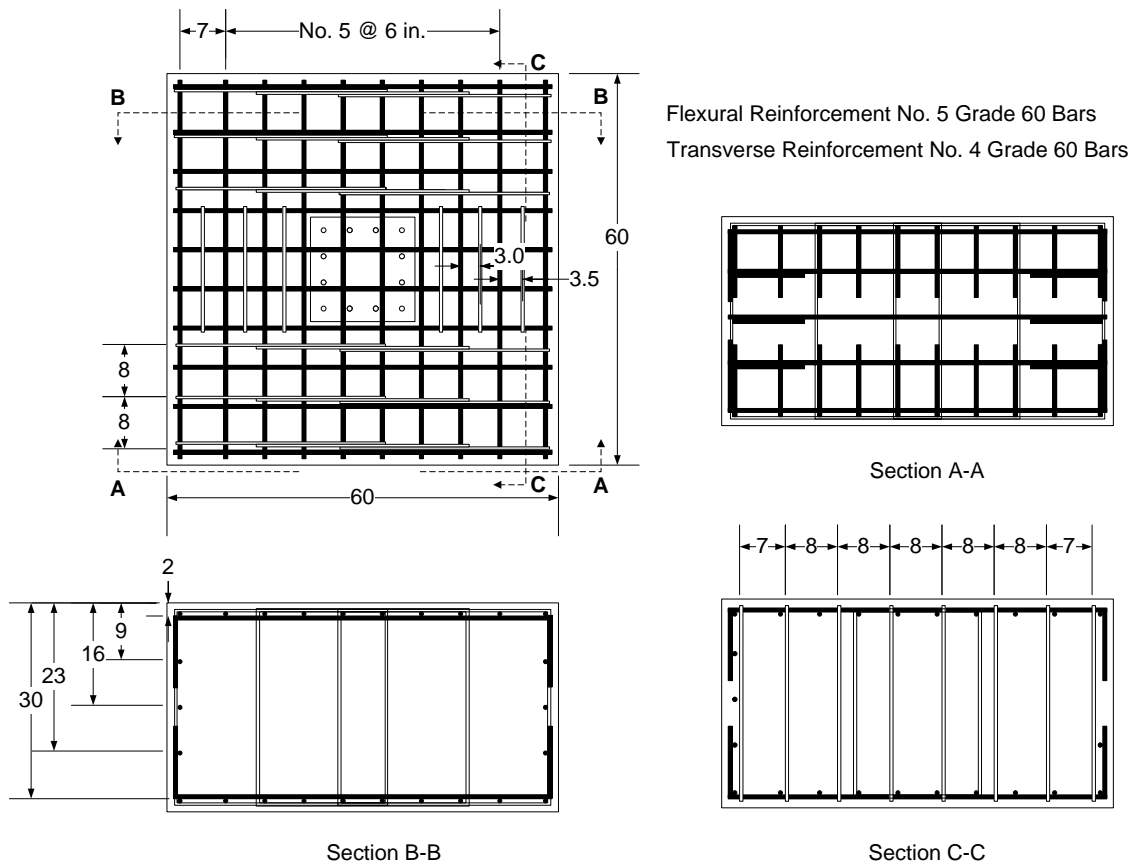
Column Reinforcement for Specimens SB1, SB2 and SB3
